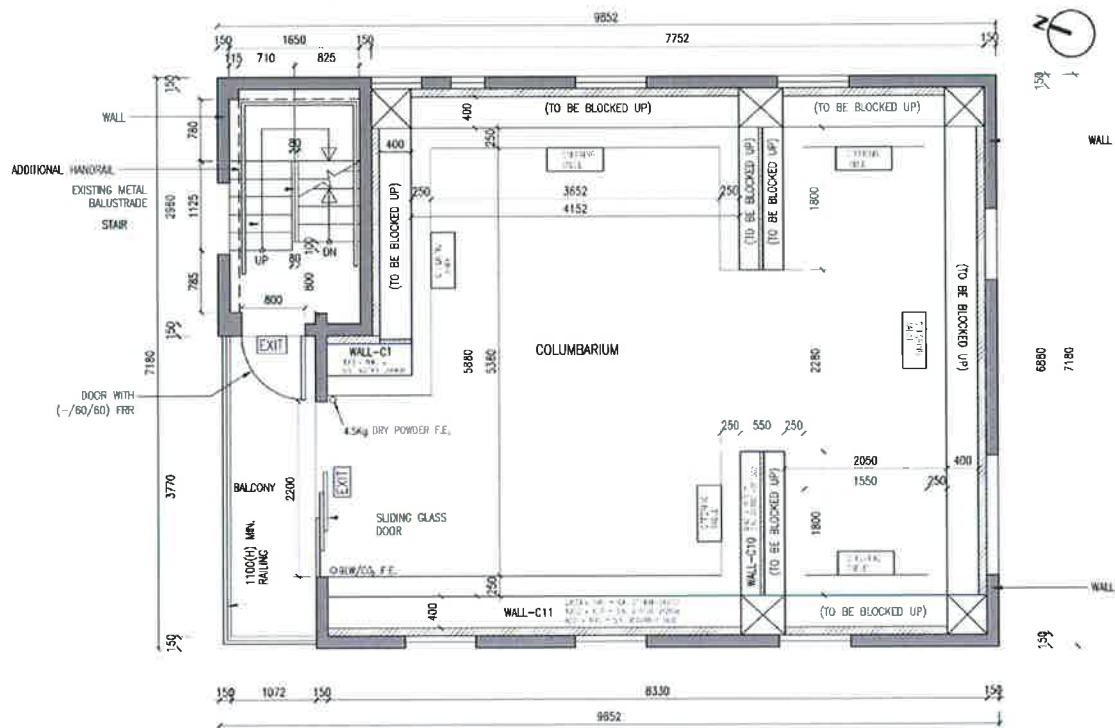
2/F (二樓) Layout Plan
